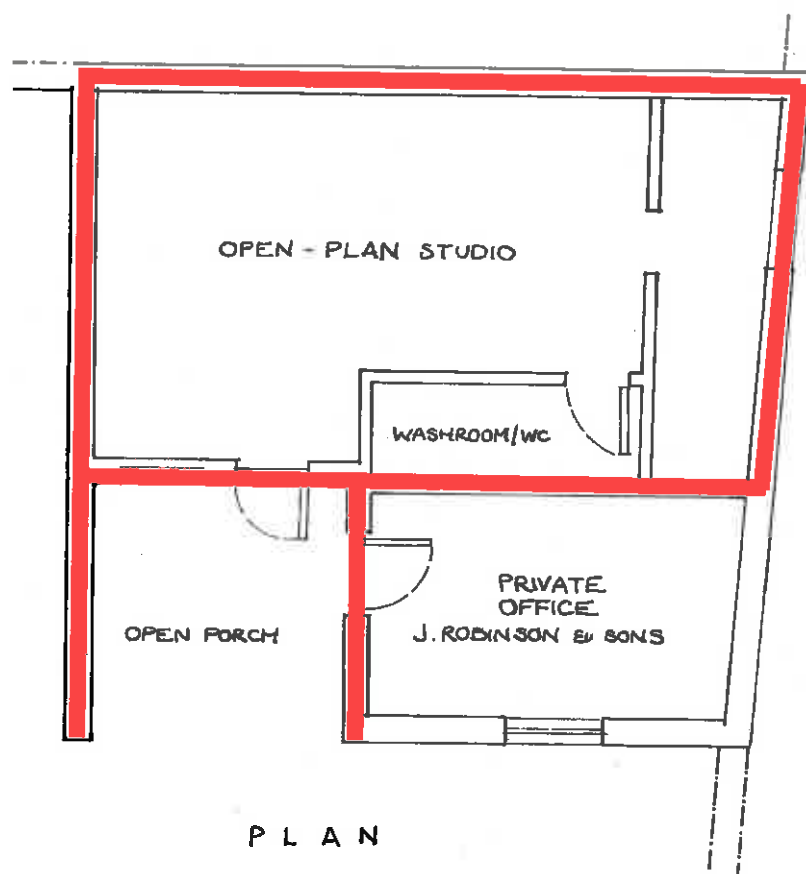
Plan of proposed studio No. 4 Eshton Terrace.
